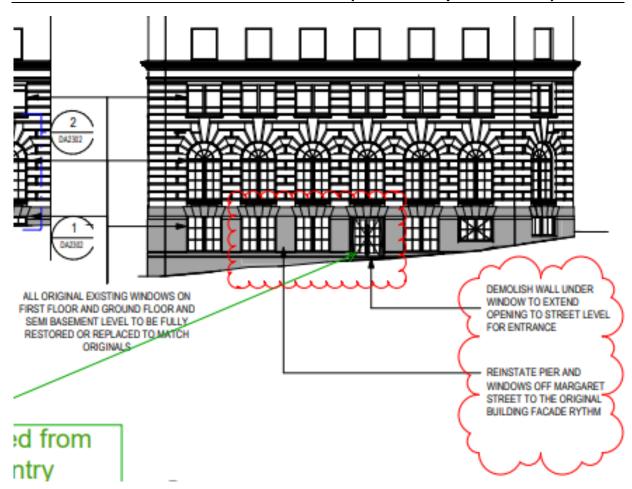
Proposed Shell House Elevation—extract showing proposed new changes to the Margaret Street (North) Elevation. (Source: Make + Architectus, DA2300, Proposed Shell House Elevations, Rev08, February 2019)
